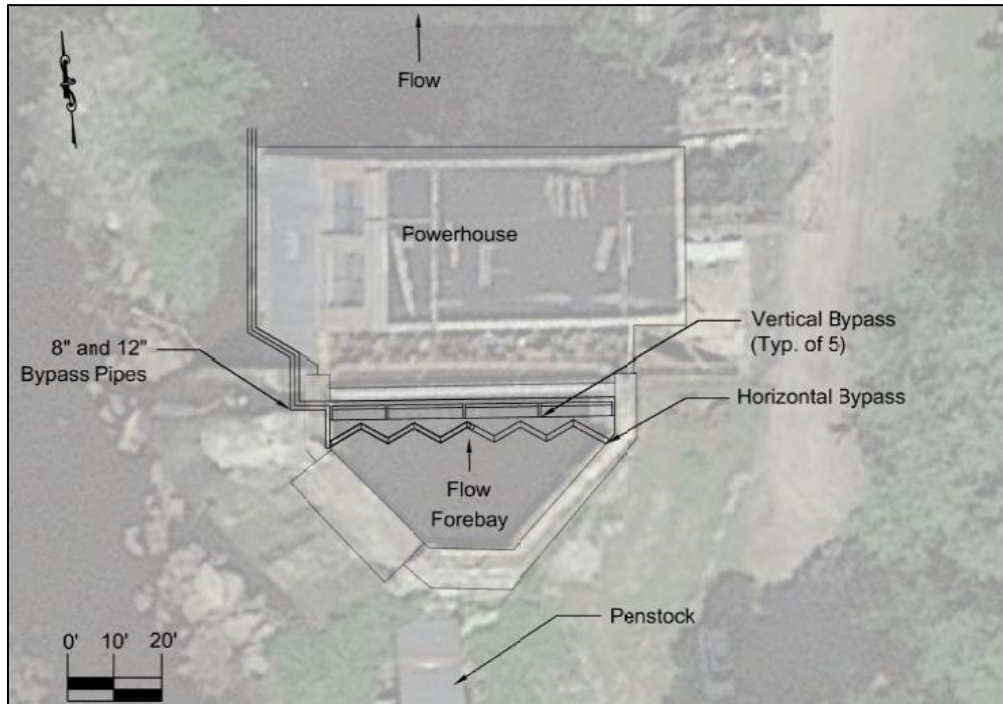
Conceptual design of vertical and horizontal bypasses installed at Pepperell (plan view).
